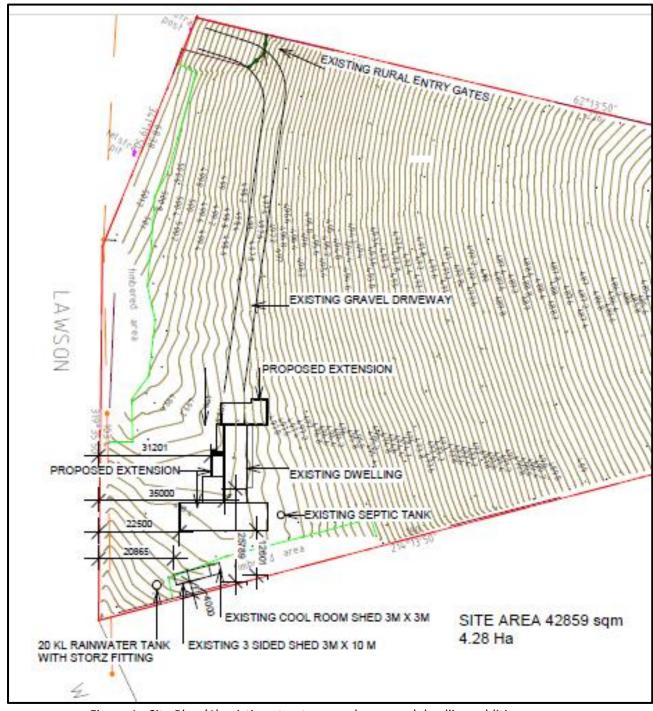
Site Plan (1) existing structures and proposed dwelling additions
